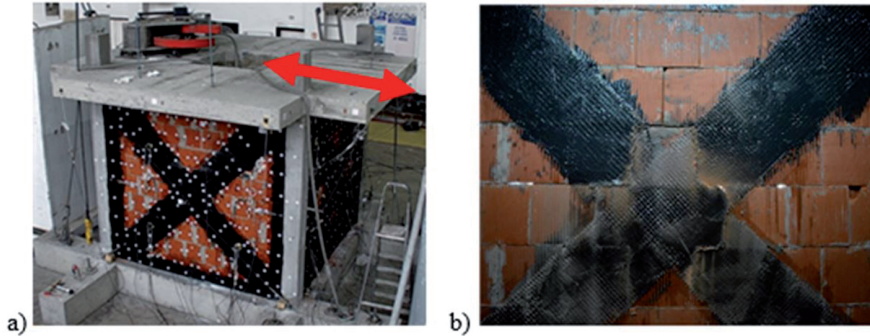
Building after completed examination (a), FRPU damage in the center of the C-type wall (b)
